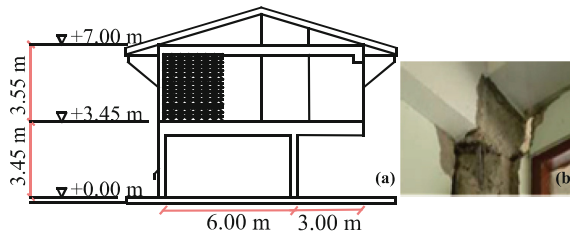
School building: (a) Elevation of 2-story, (b) Observed damage.
